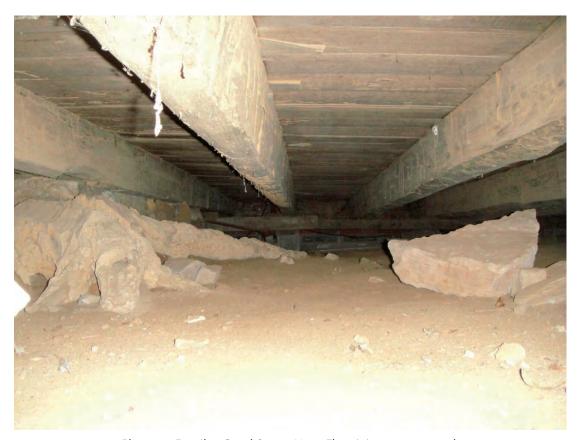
Detail at Crawl Space. Note: Floor joists are supported by a mix of rock outcroppings and some irregularly spaced piers.
